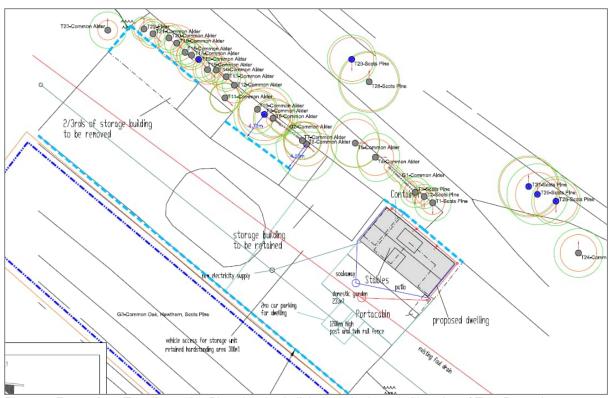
Extract from Tree Protection Plan showing in light blue the intended location of Tree Protection Fencing
